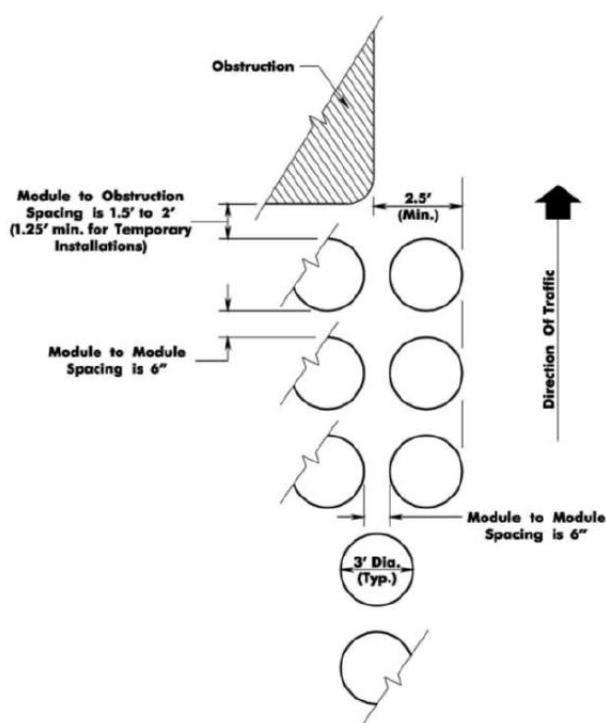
Suggested Layout for the inertial barriers (New Jersey Department of Transportation, 2013)
